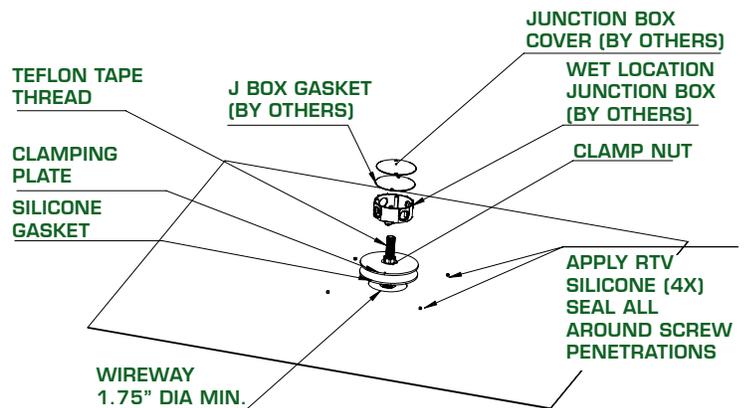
CANOPY INSTALLATION CROSS SECTION VIEW
